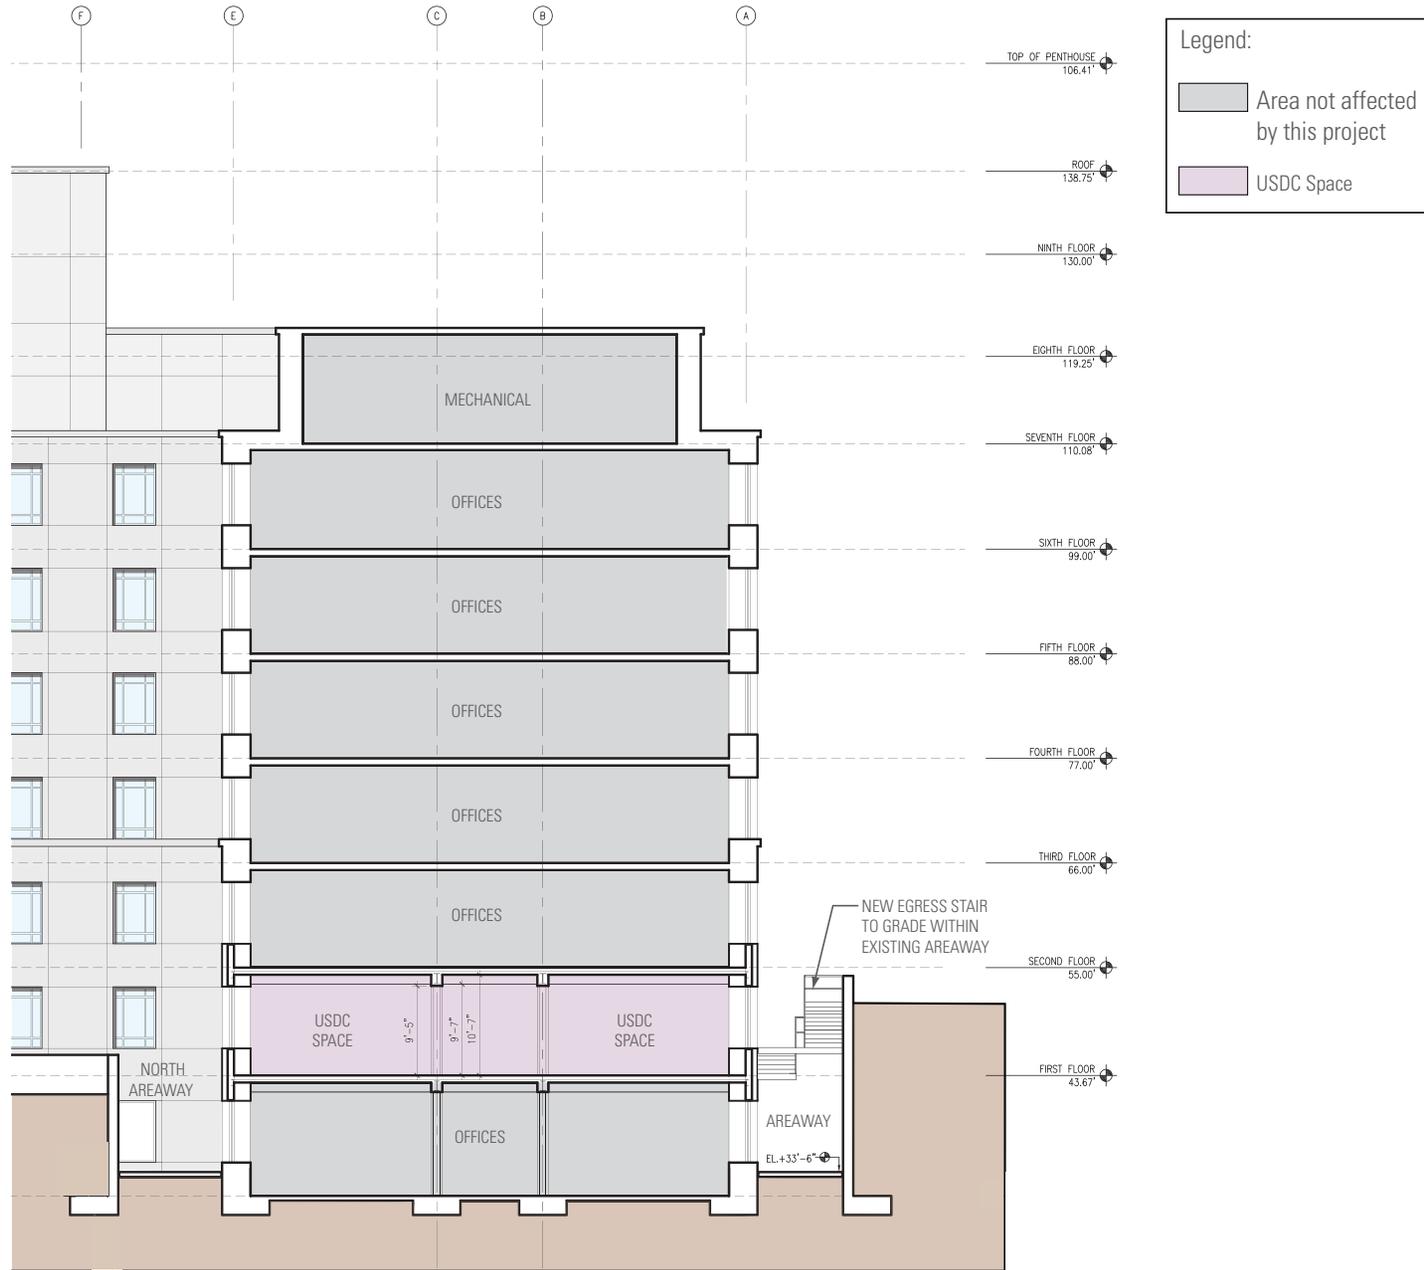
USDC Exhibit Hall III: North/South Section
